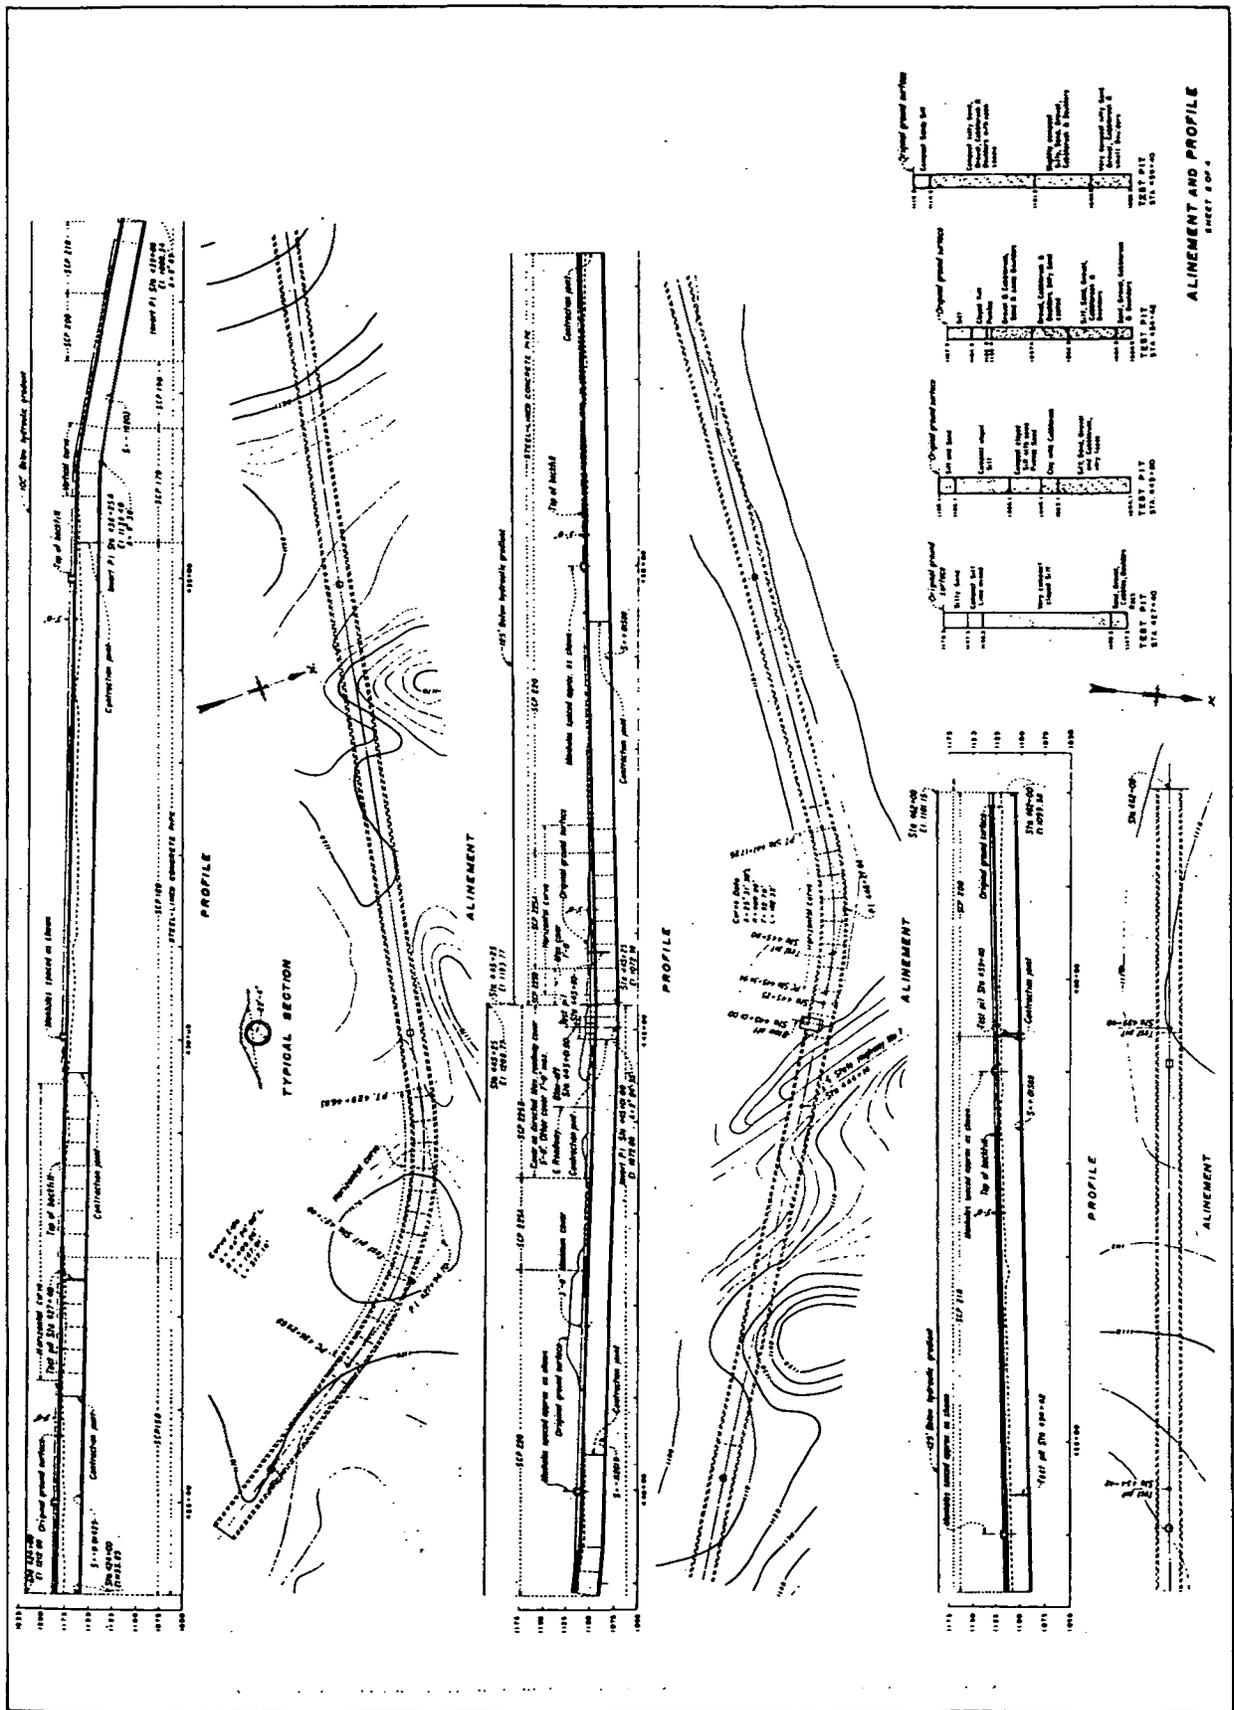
Alignment and profile of the steel-lined concrete pipe (Sheet 2).
